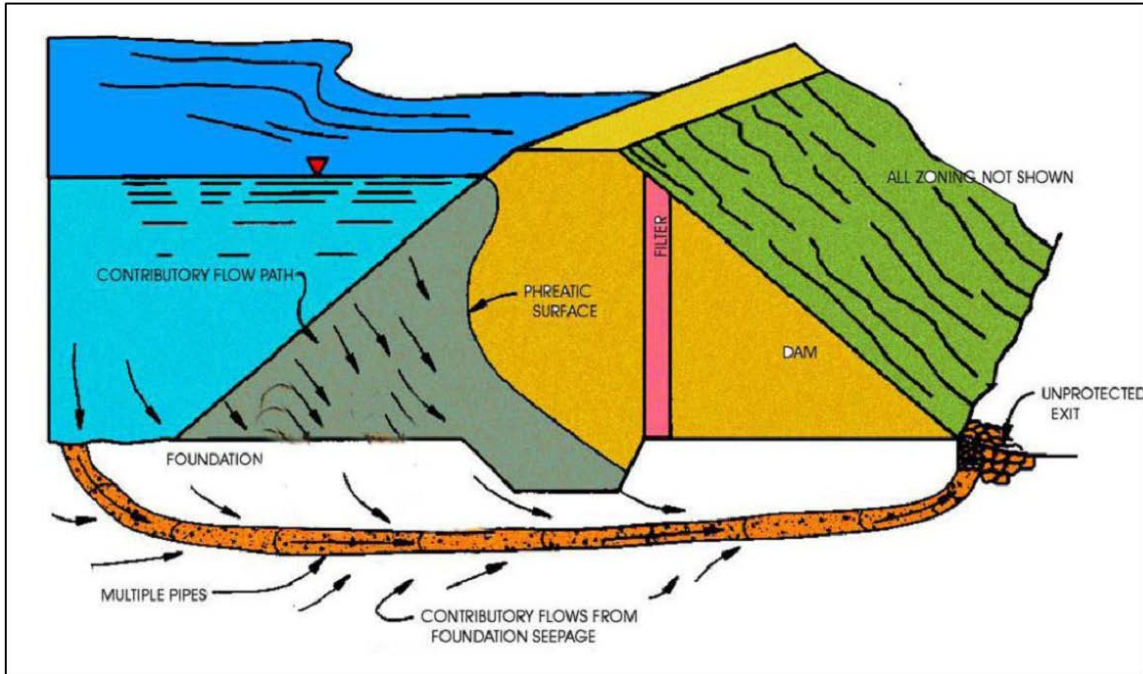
SEEPAGE LEADING TO PIPING (INTERNAL EROSION) THROUGH THE FOUNDATION ON AN EMBANKMENT DAM
